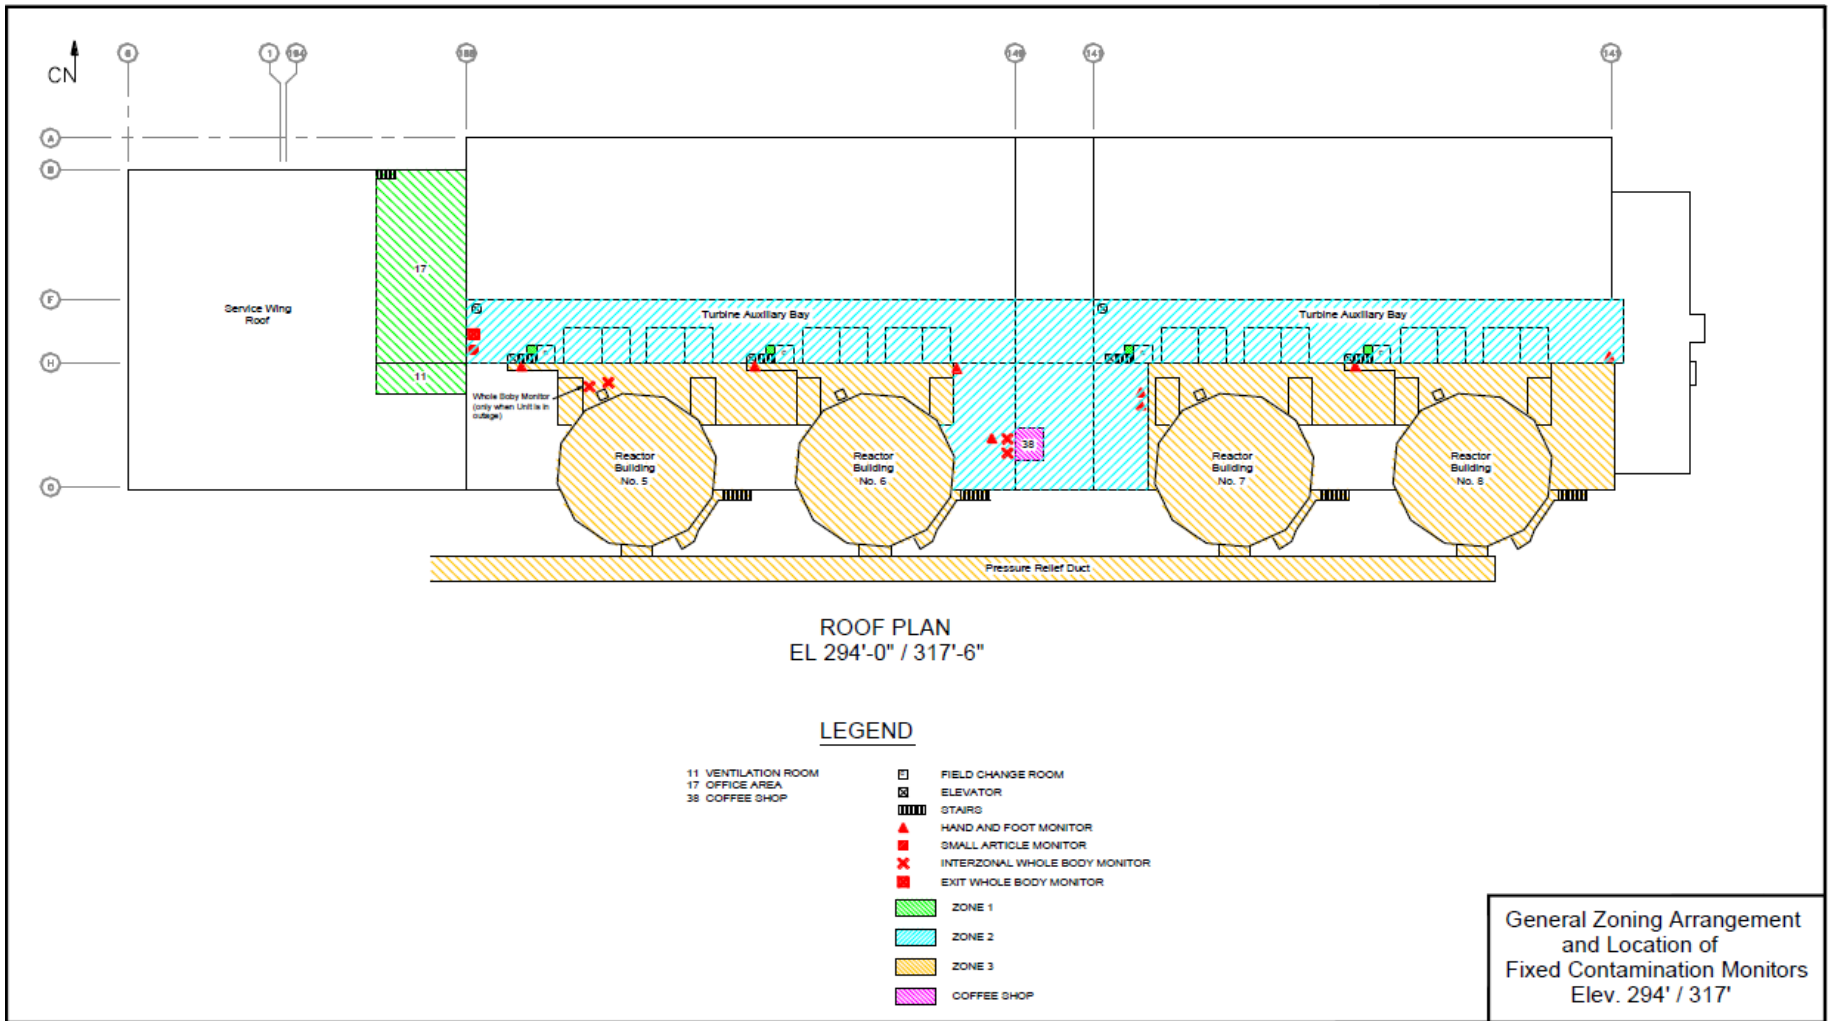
Pickering 5-8 294'/317' Elevation Zoning Arrangement
